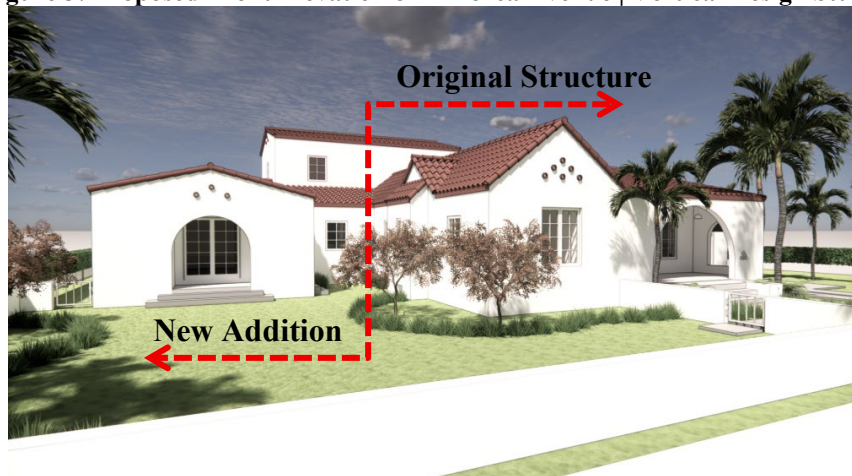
Proposed Front Elevation of Minorca Avenue | Vertical Design Studio
